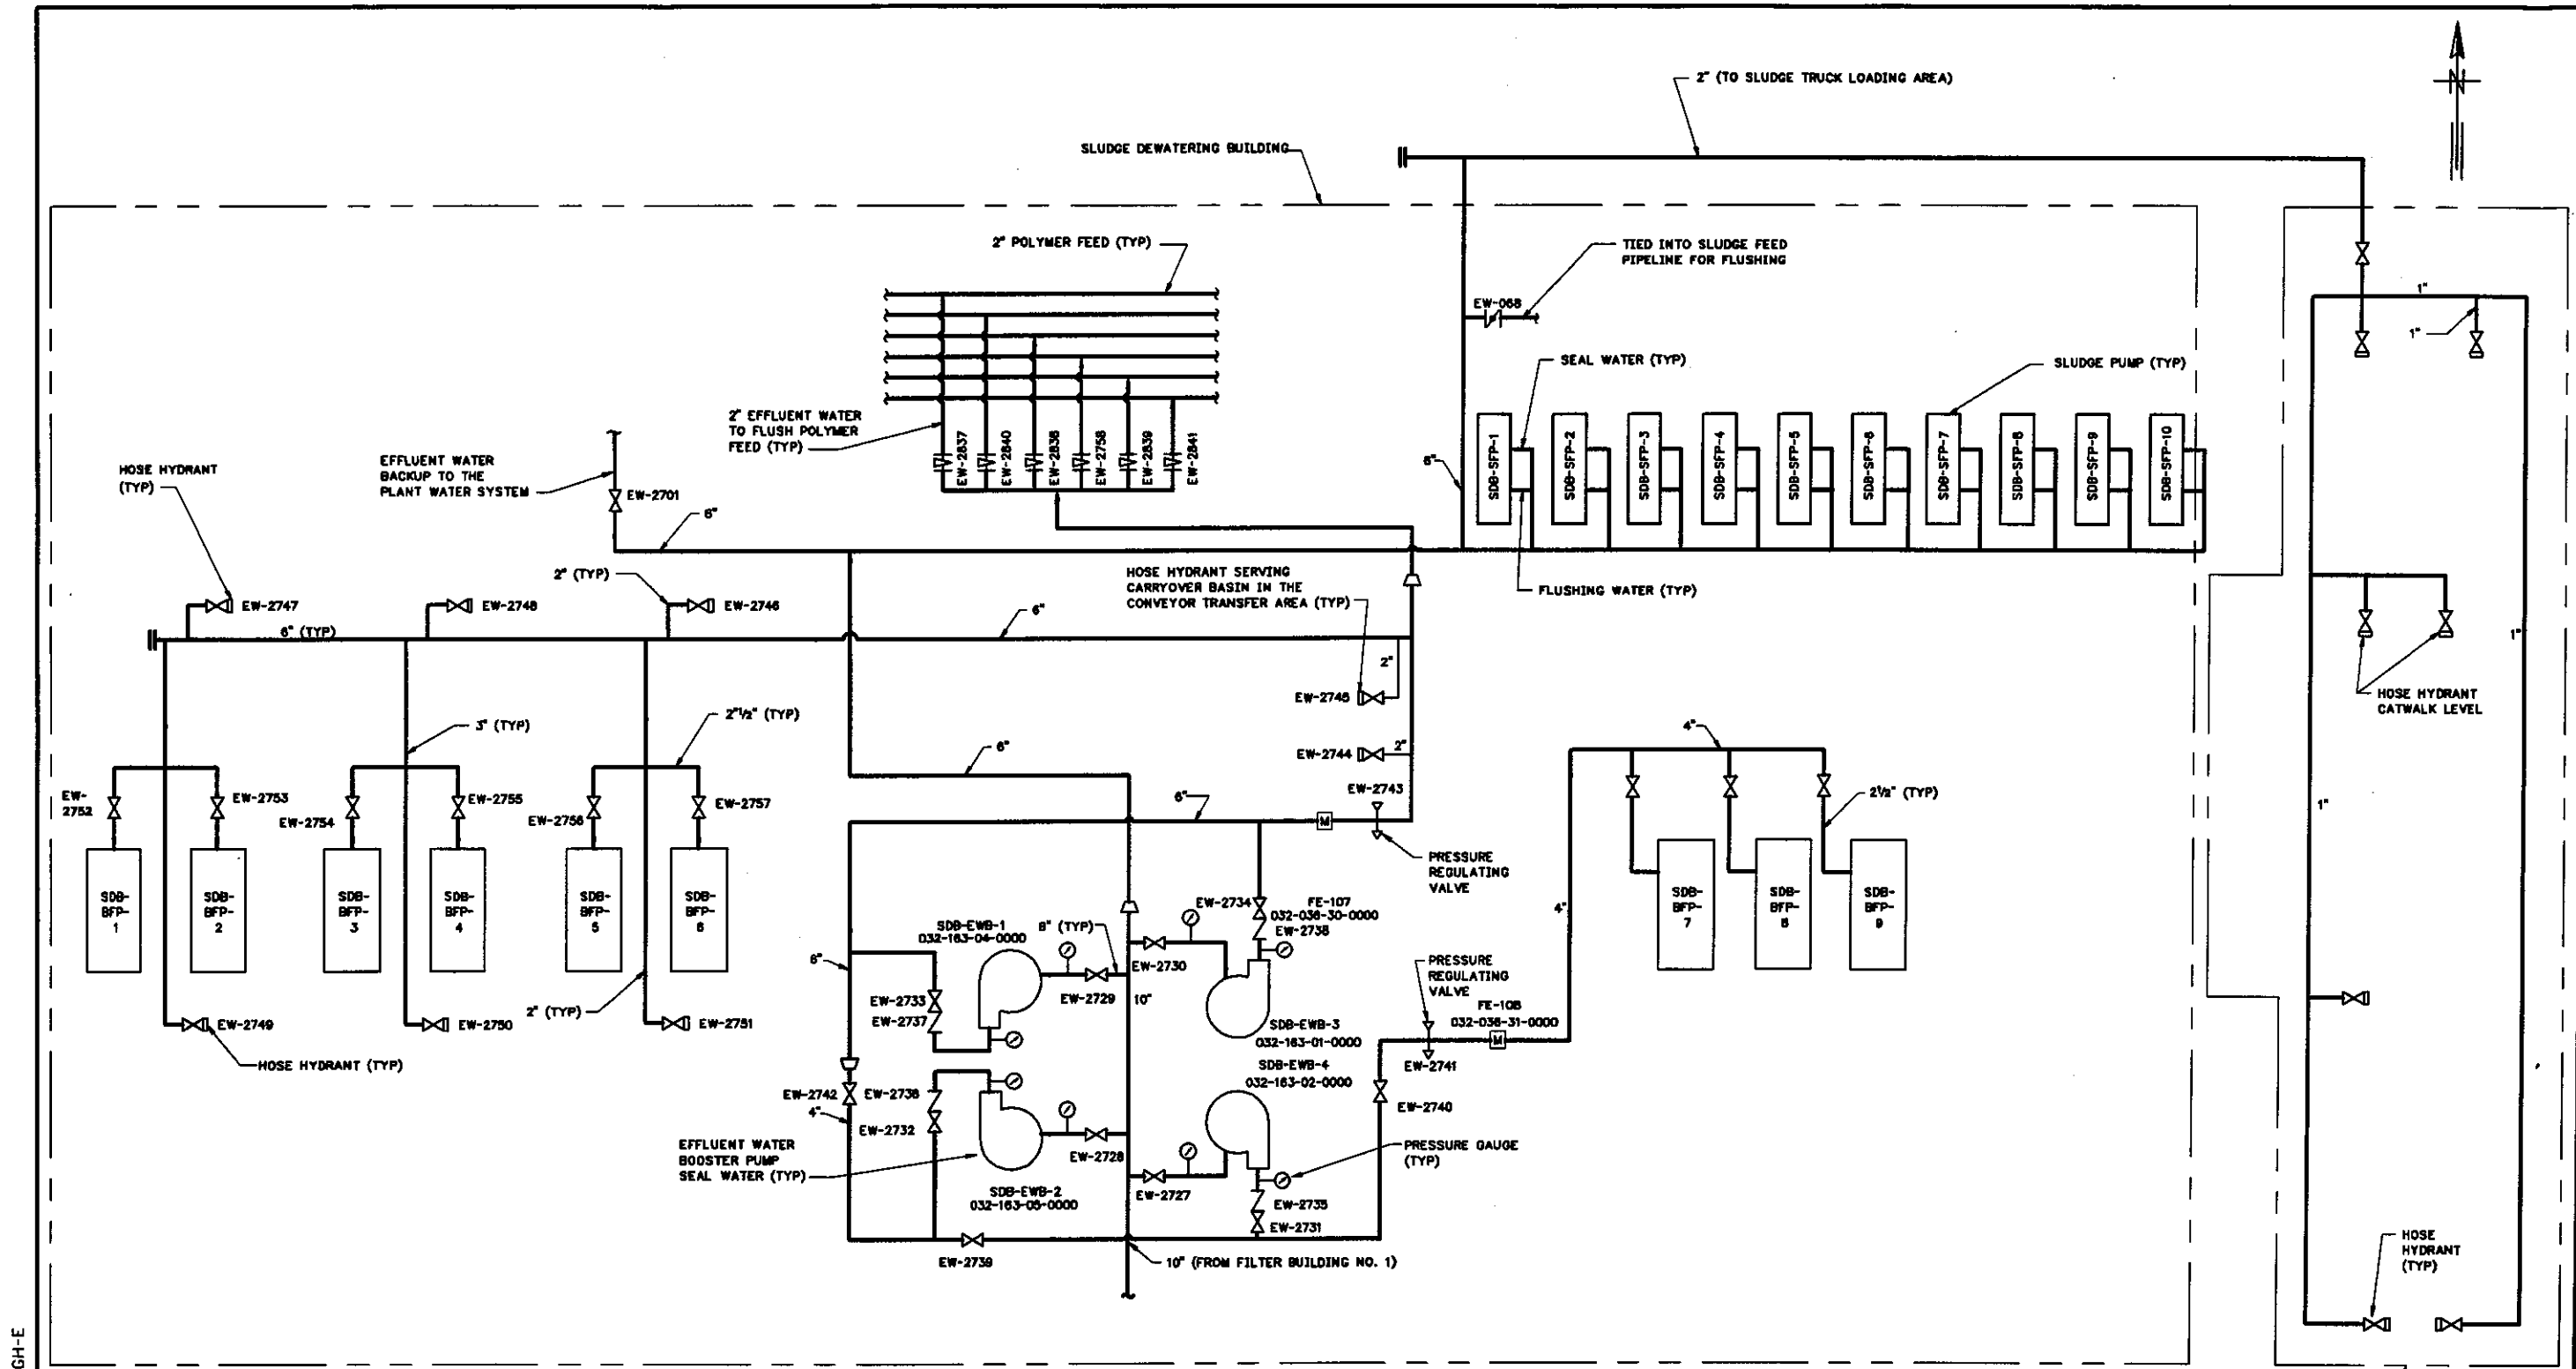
FIGURE III-SD-SDB-6 SLUDGE DEWATERING BUILDING EFFLUENT WATER DIAGRAM
